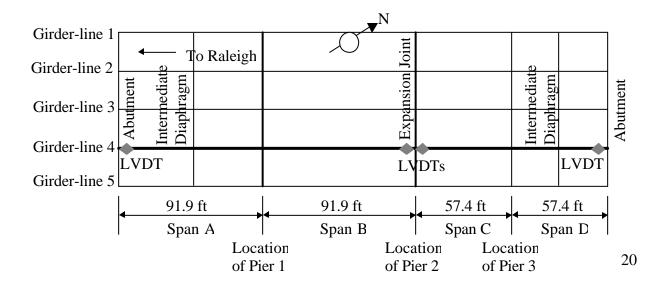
Locations of Installed LVDTs underneath the Bridge Deck along Girder-line 4
